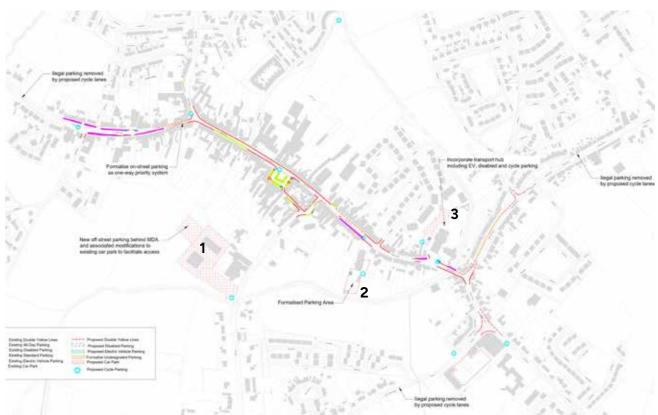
Existing and parking Diagram, taken from the Draft Local Transport Plan, 2025
